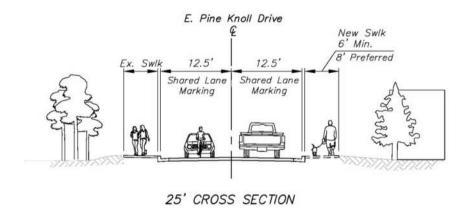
Proposed Cross-Sections: Pine Knoll Dr.: South of McConnell Dr. Intersection
